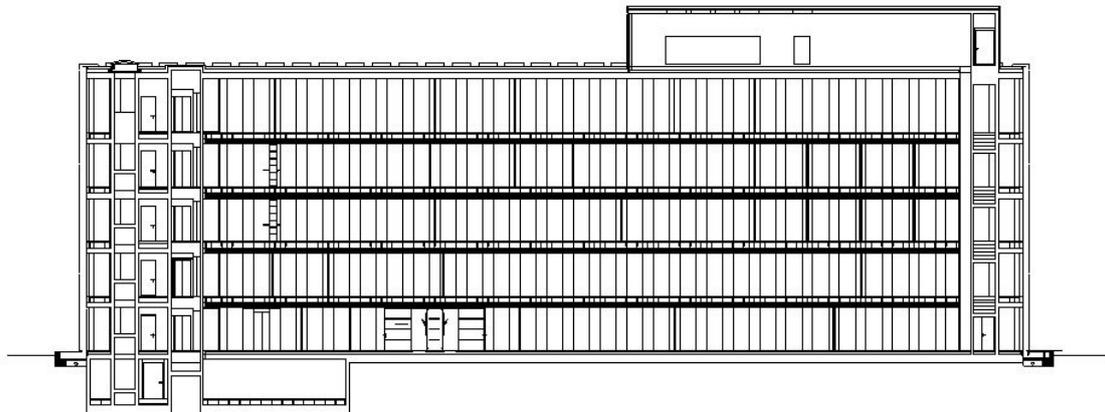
East-west cross section of the Chiasso-Brogeda building used for the definition of the reference building.
